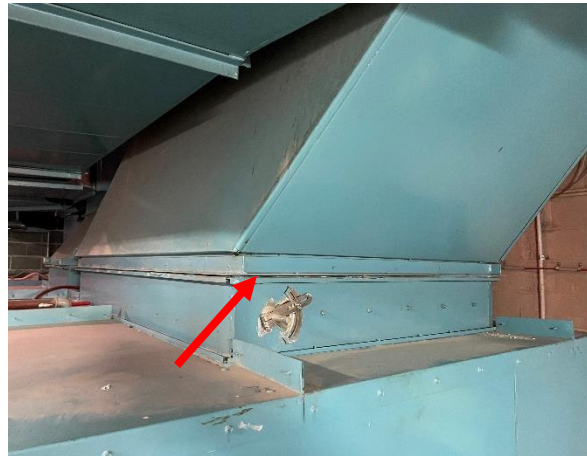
Main Warehouse – asbestos containing grey mastic to fire dampeners in air handling unit within administration plant room
